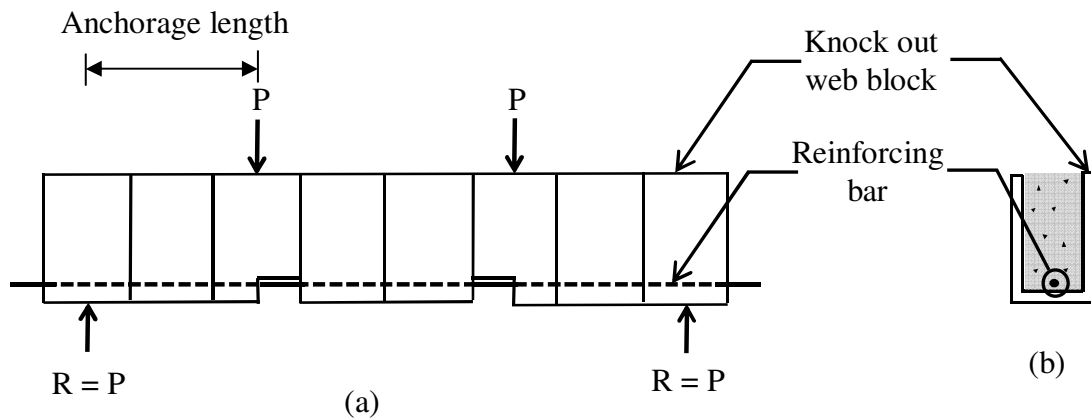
Lintel beam tests by Baynit : (a) beam elevation, and (b) cross-section (Baynit,1980).
